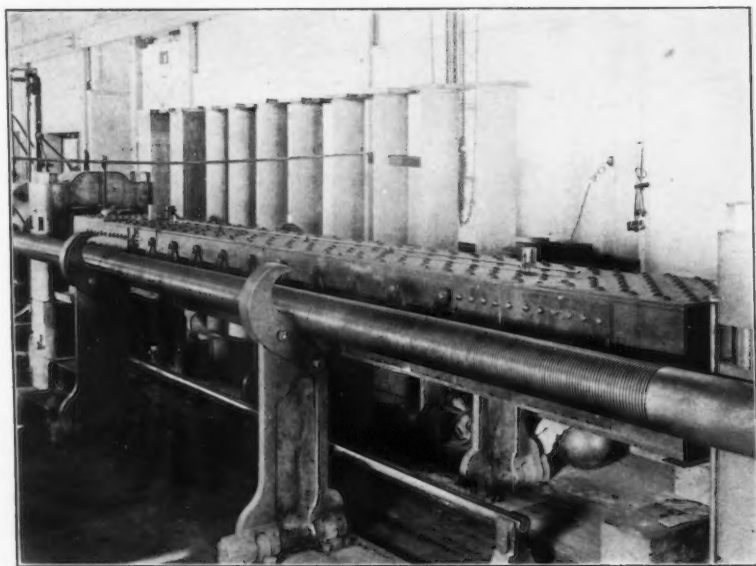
APPEARANCE OF COLUMN NO. 1 IN TESTING MACHINE.
